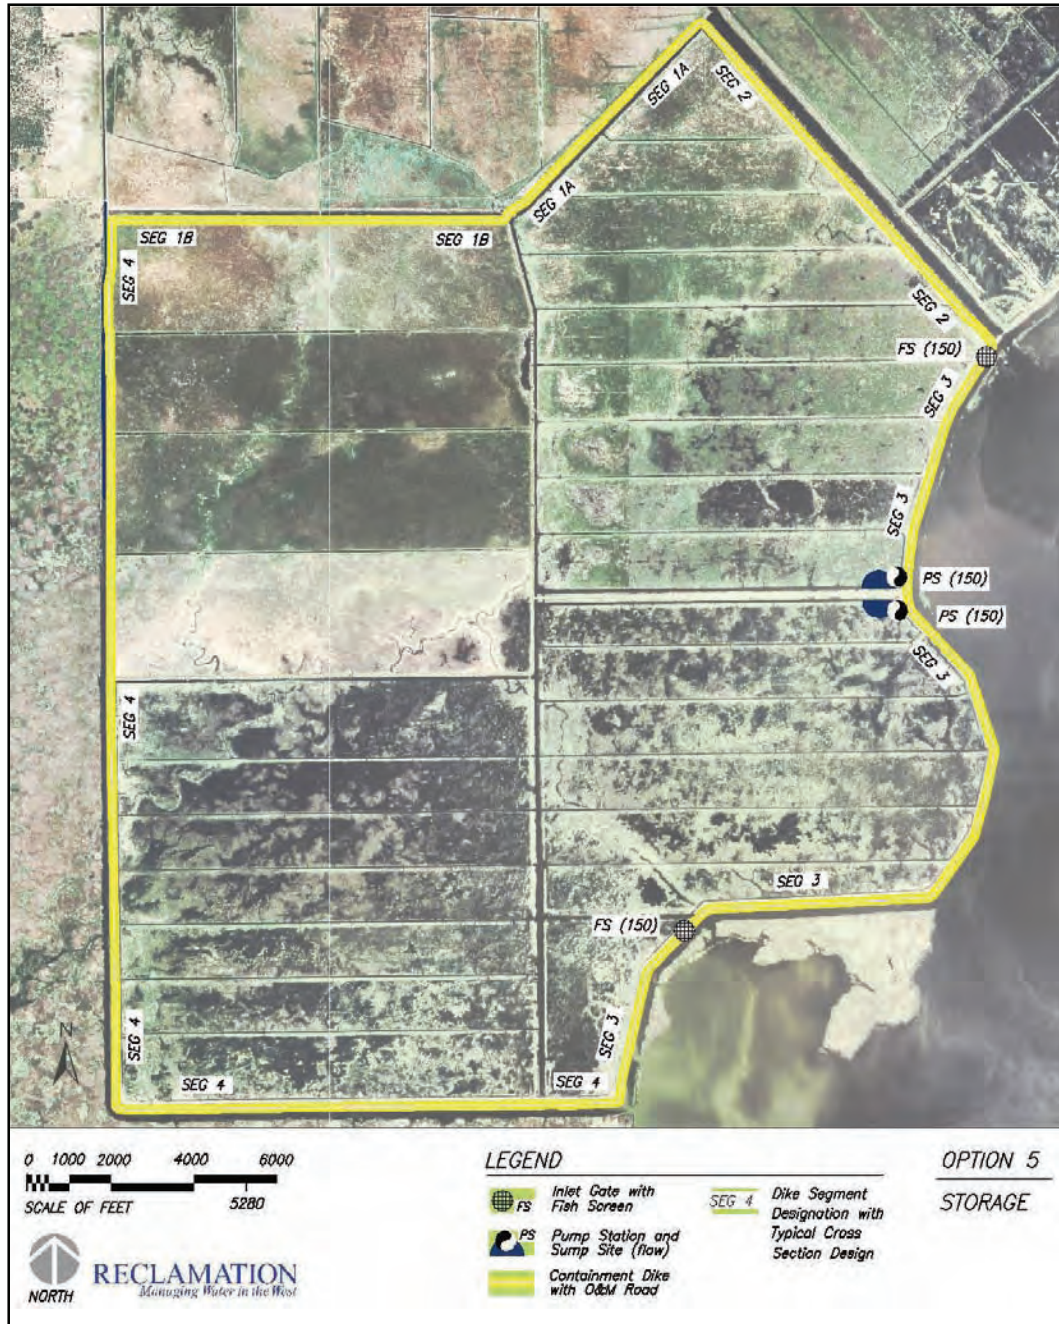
BR and ALR preliminary site layout showing Option 5—Permanent seasonal managed storage operations with site construction work required to reinforce and raise the existing perimeter dikes.
